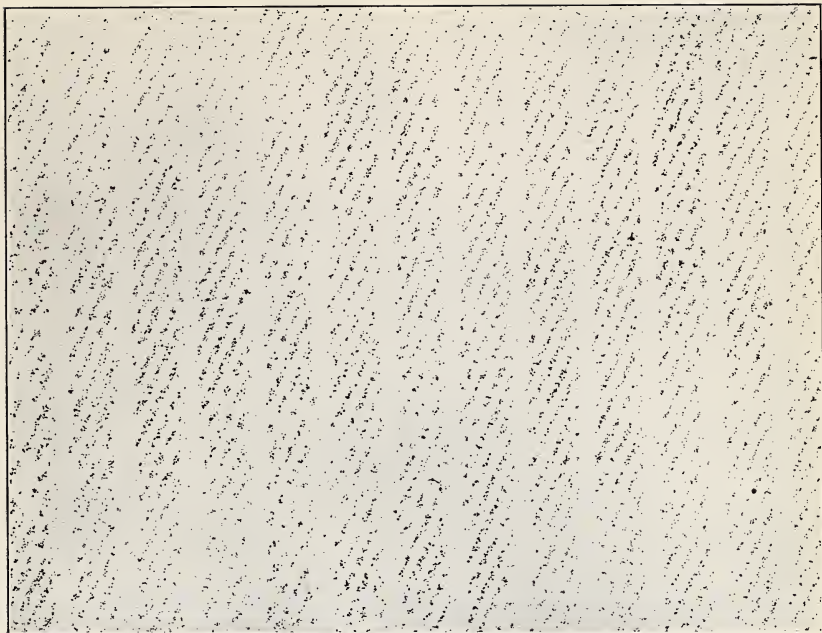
SURFACE OF STONE, FRESHLY DRESSED.
